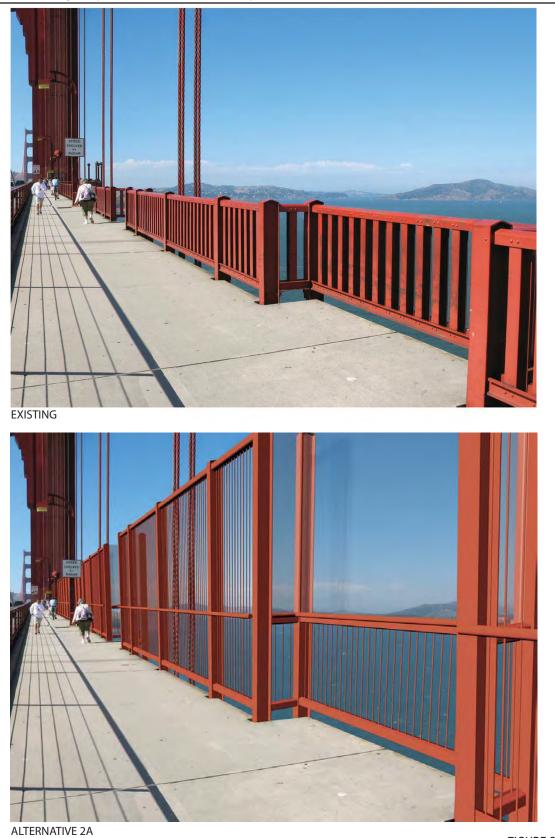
VIEWPOINT 12: SIDEWALK VIEW NORTH - ALTERNATIVE 2A
